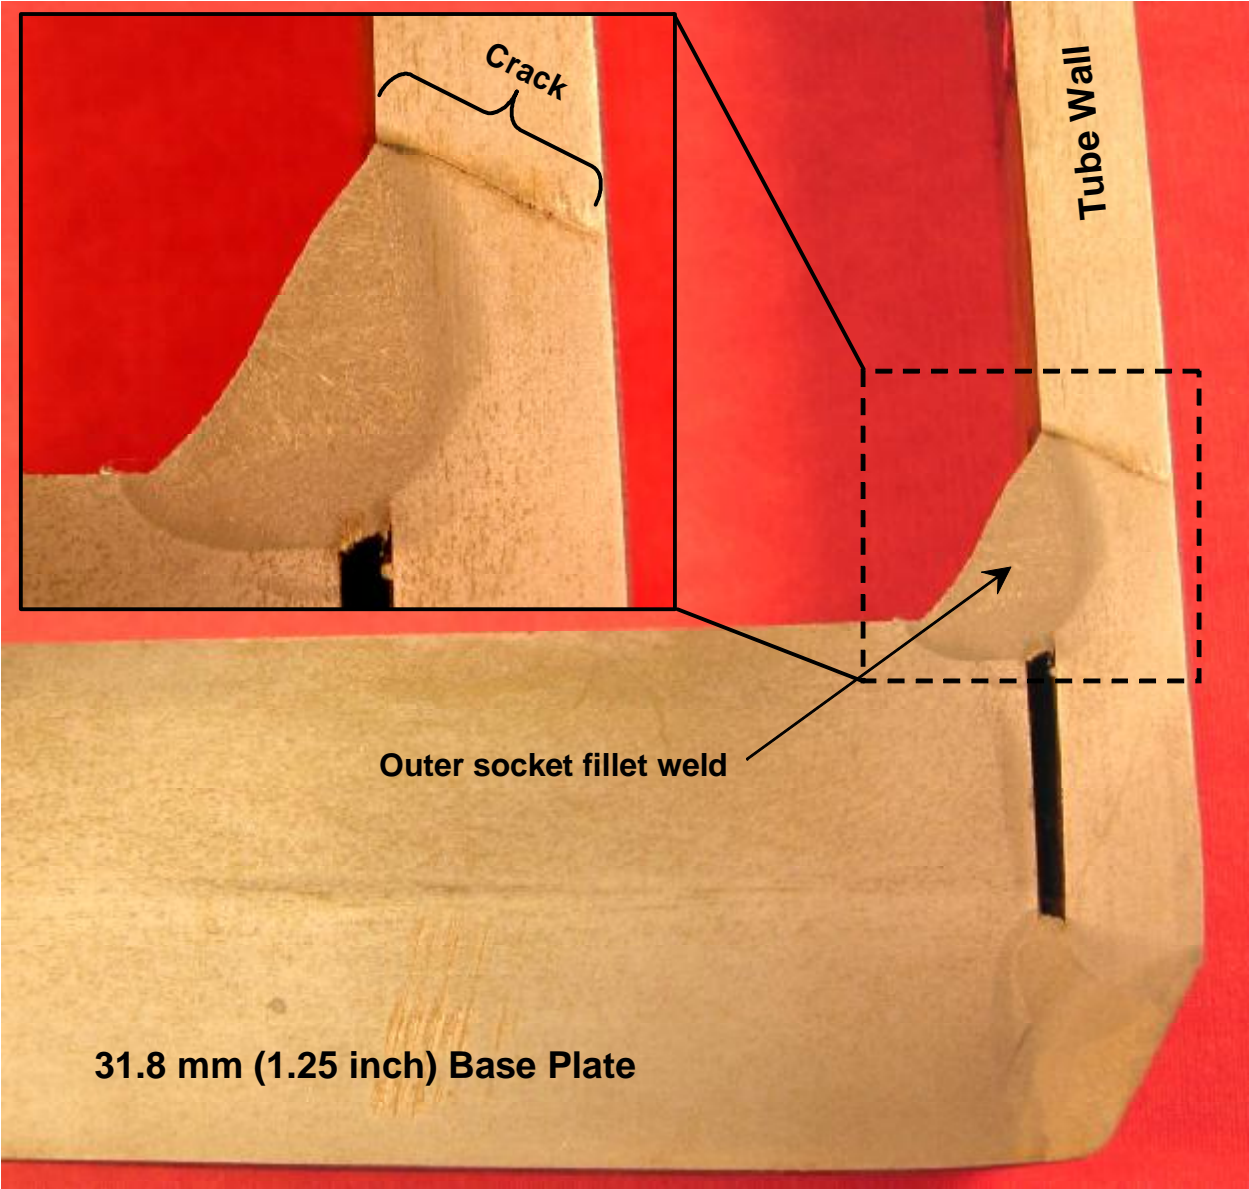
Macro etched cross-section of weld toe crack.
